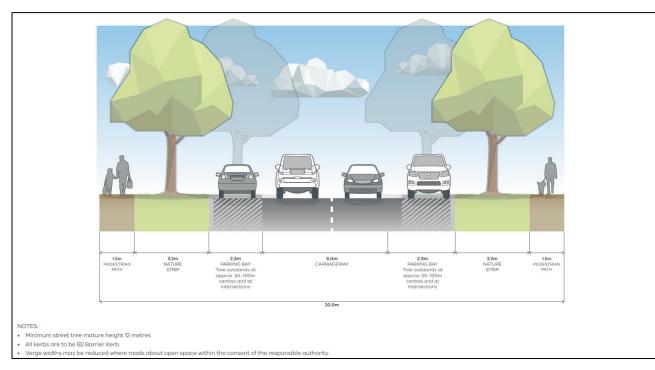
Local access street (level 2) cross section - 20m (Source: VPA)
